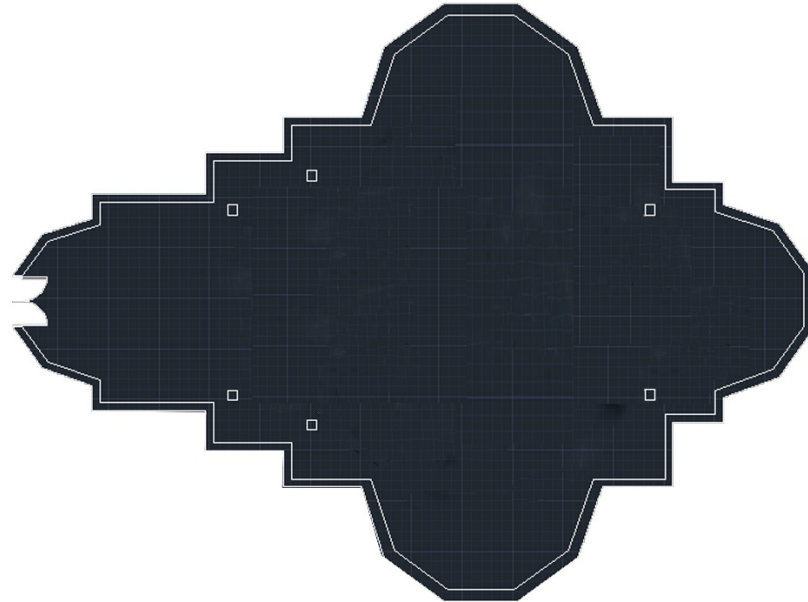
Floor plan of Church (Source: AutoCAD drawing)
